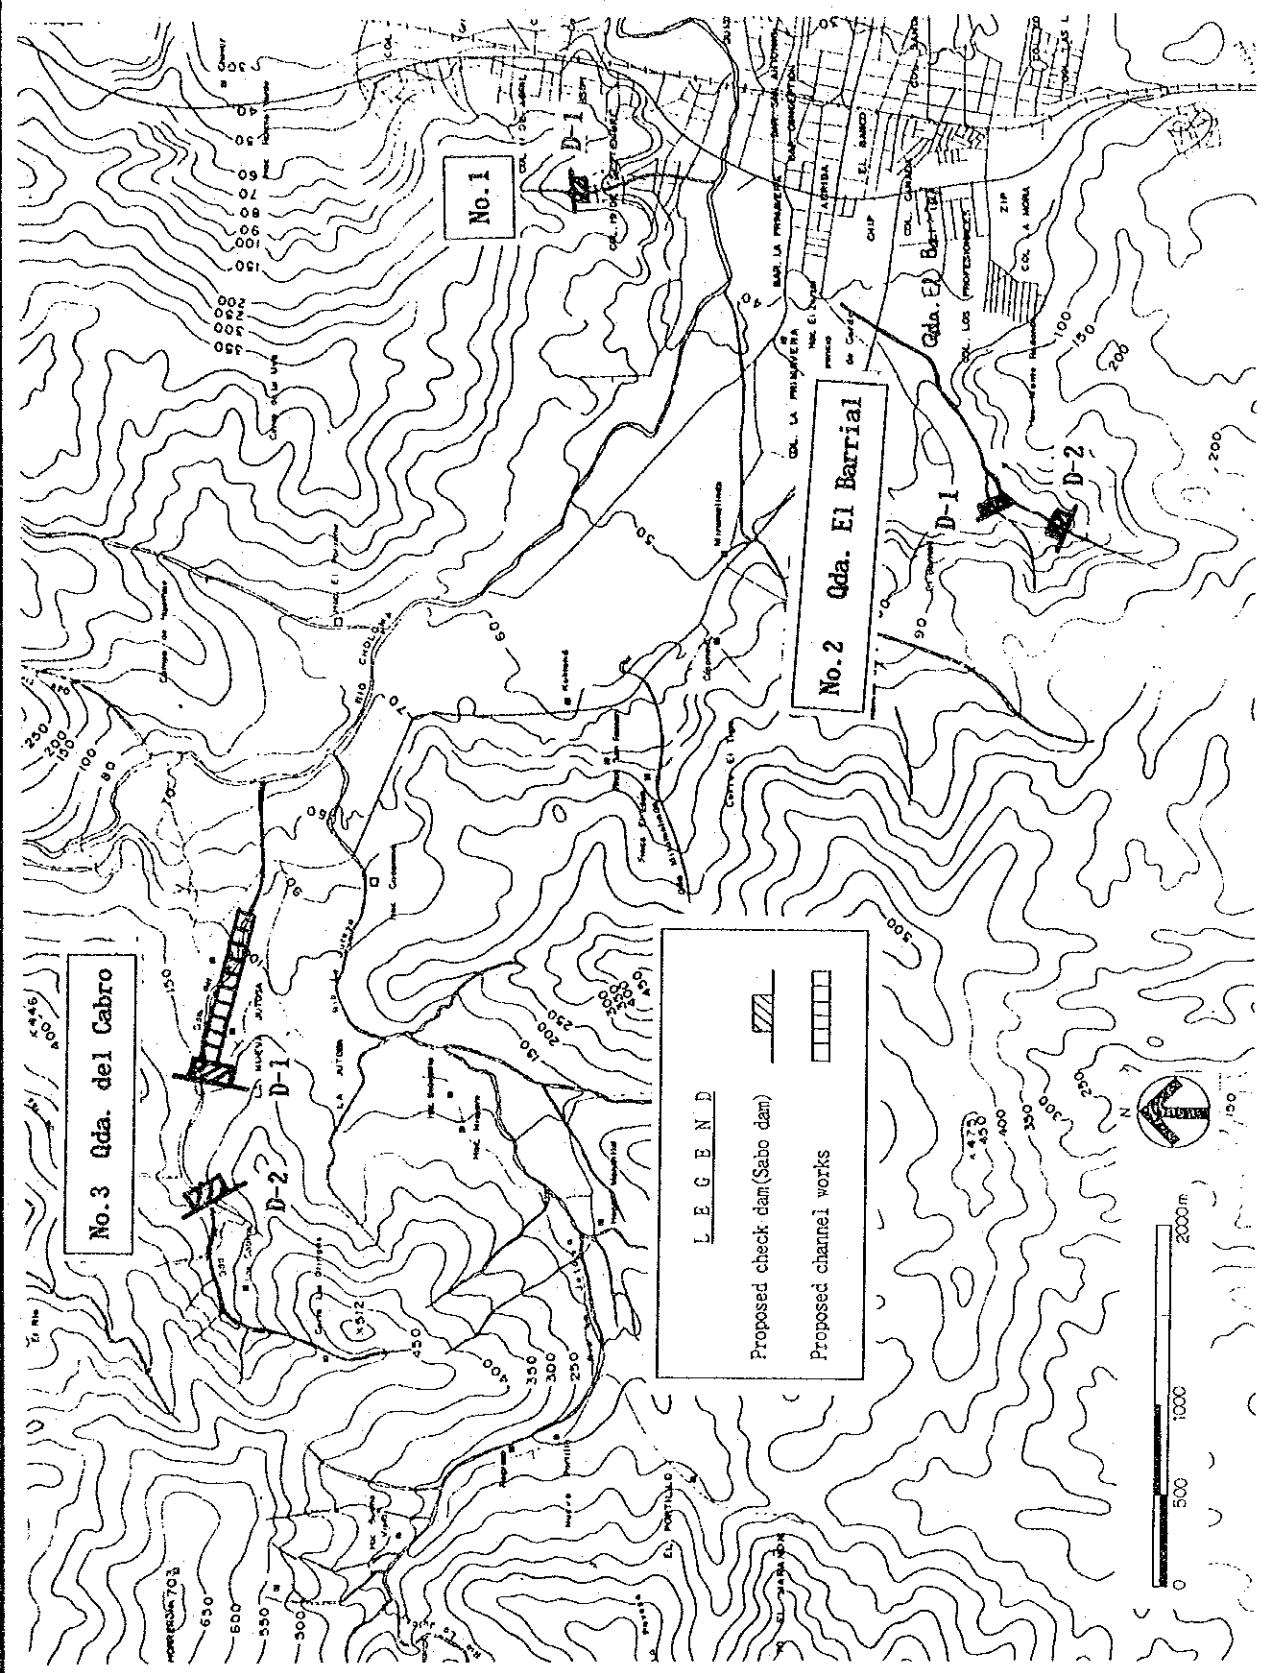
PROPOSED LOCAL EROSION CONTROL PLAN
